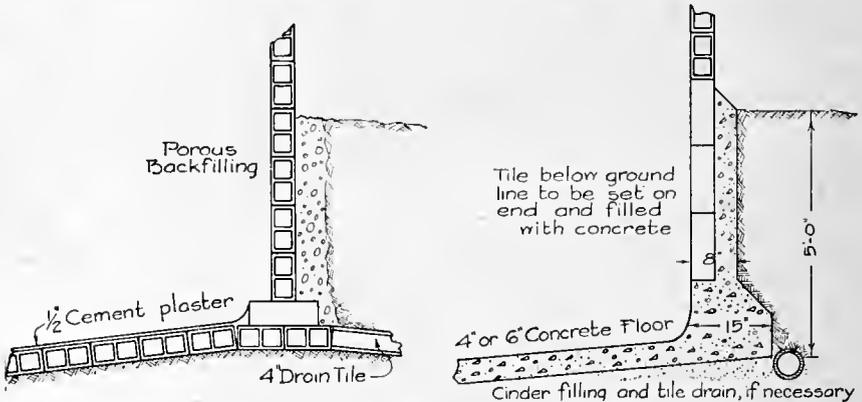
Type 1 Foundation at Left Constructed Entirely of Clay Blocks and Type 2 Foundation at Right Constructed of Blocks and Concrete.
